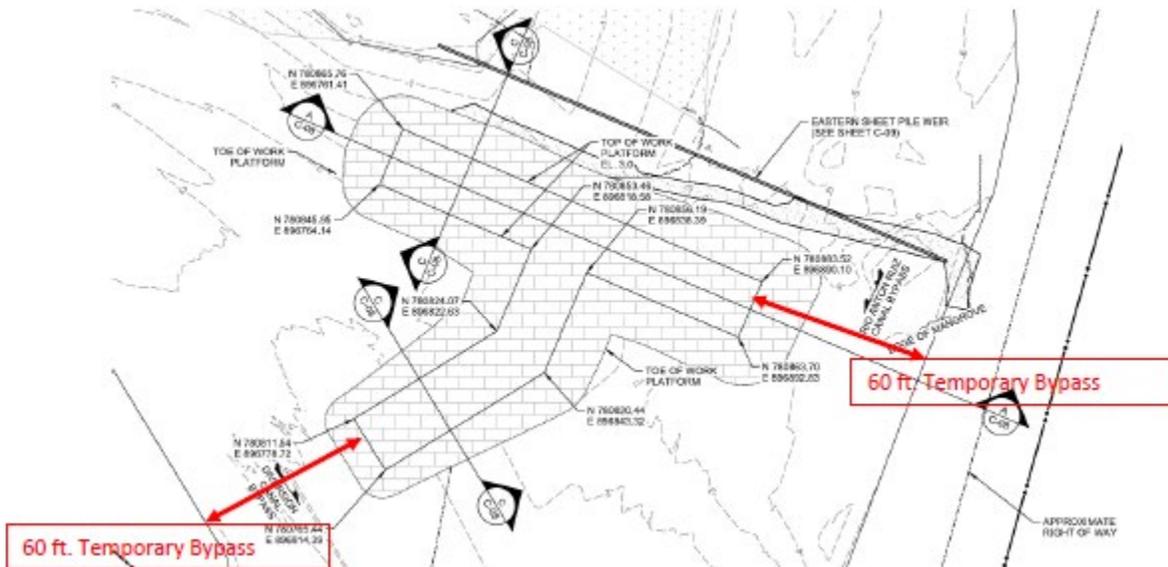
2020 Recommended Plan (Western Conceptual Temporary Work Platform)
